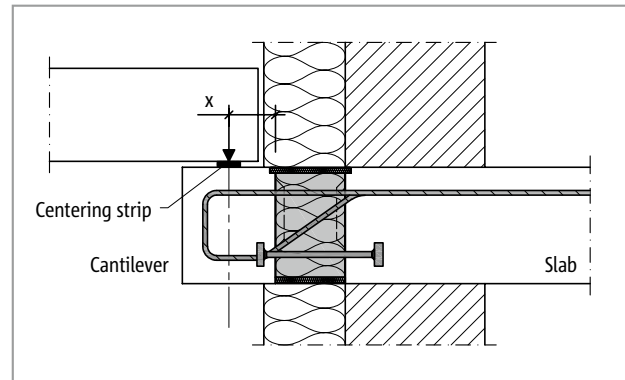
Schöck Isokorb® XT type O: Connection of a console as floor support; centering battens prevent a displacement of the load application point
